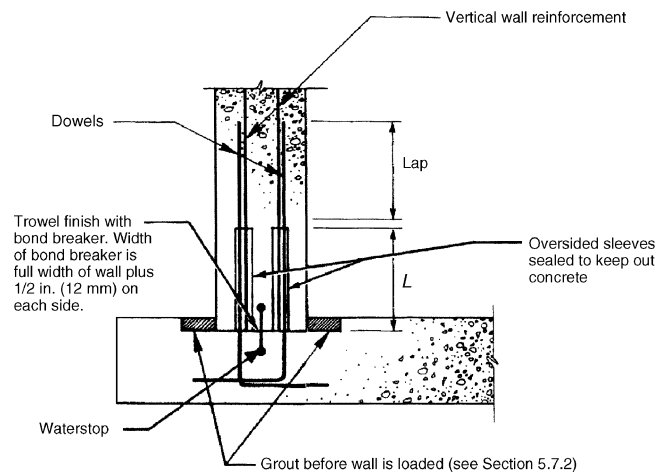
Typical wall base: Section A-A (Fig. 5.21).
